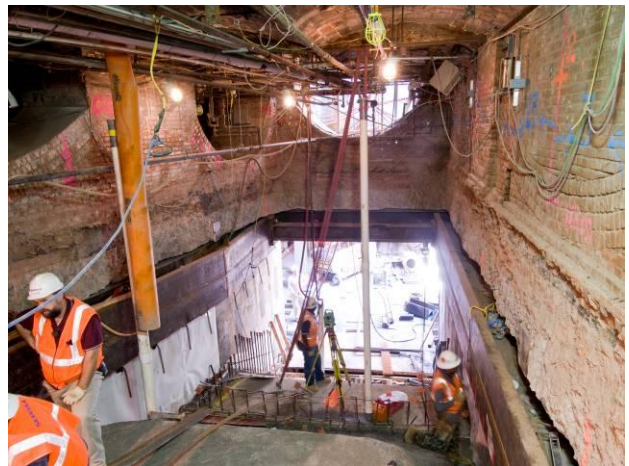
The escalator pit beneath the Corbin Building, facing west.
